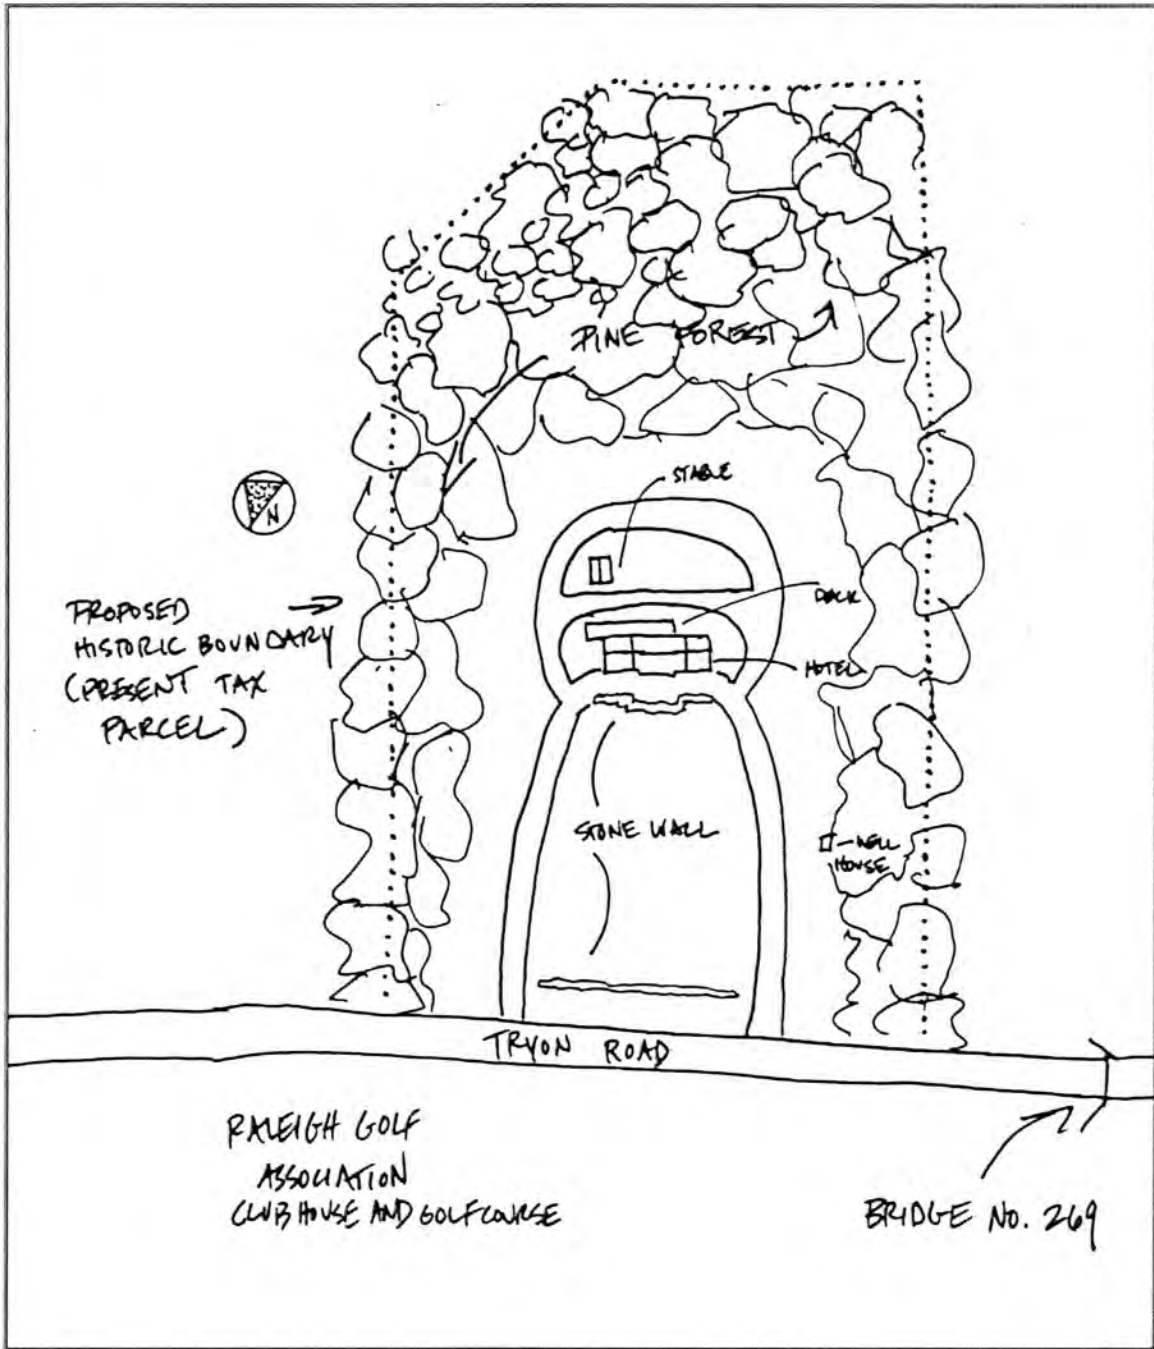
Carolina Pines Hotel, Site Plan with Proposed Historic Boundary
